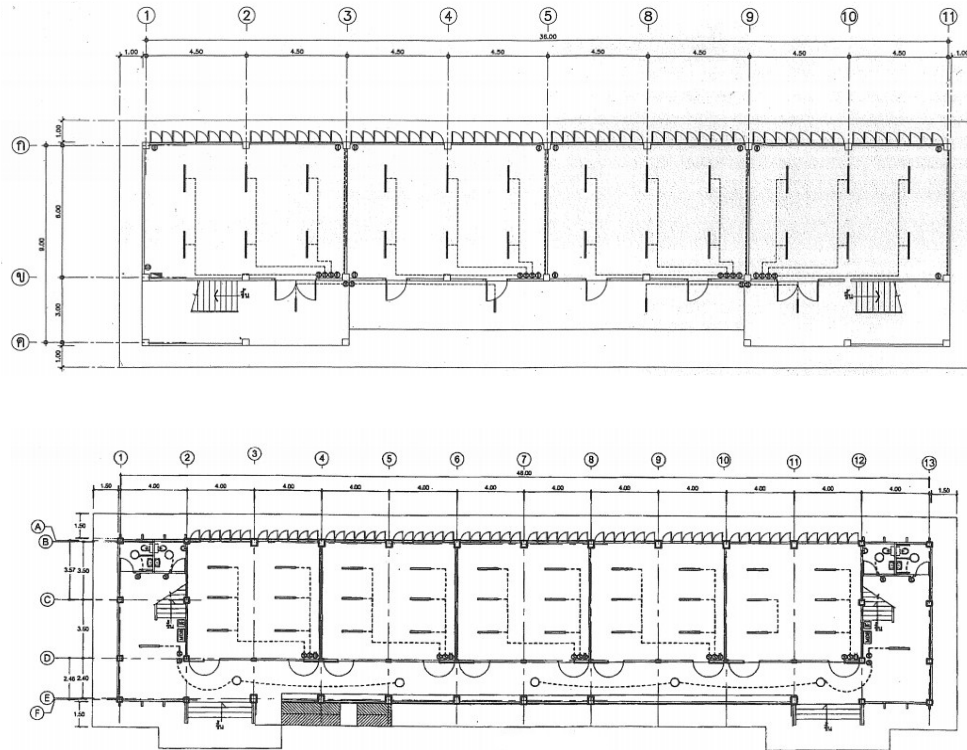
(a) An example of Type C school building plan with 7x8m classrooms and (b) Type D with 6x9m classrooms.
